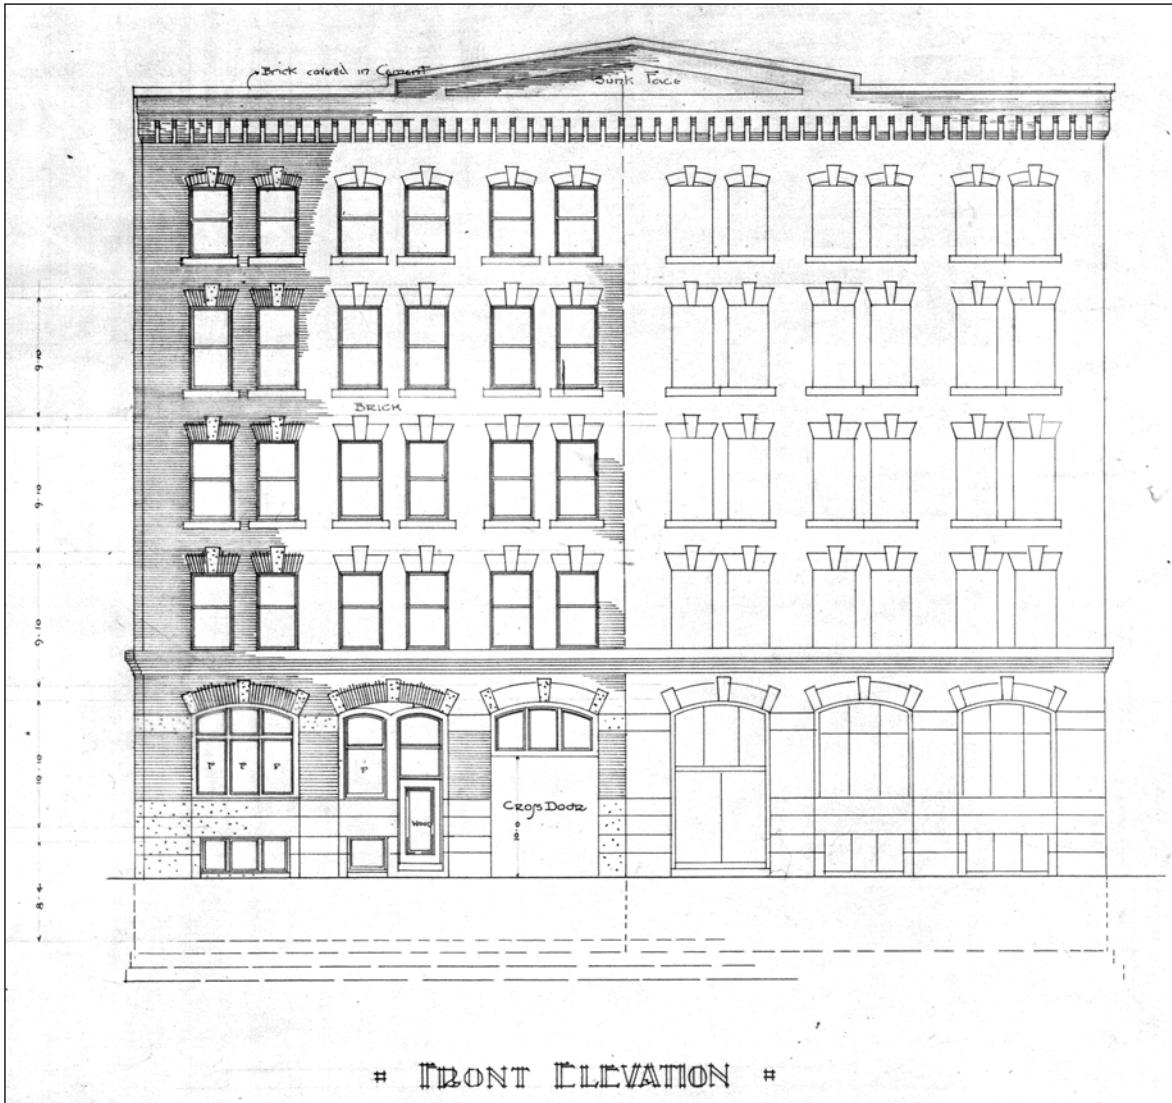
Architect’s plans, #1558/1907, “Front Elevation.” (City of Winnipeg.)
